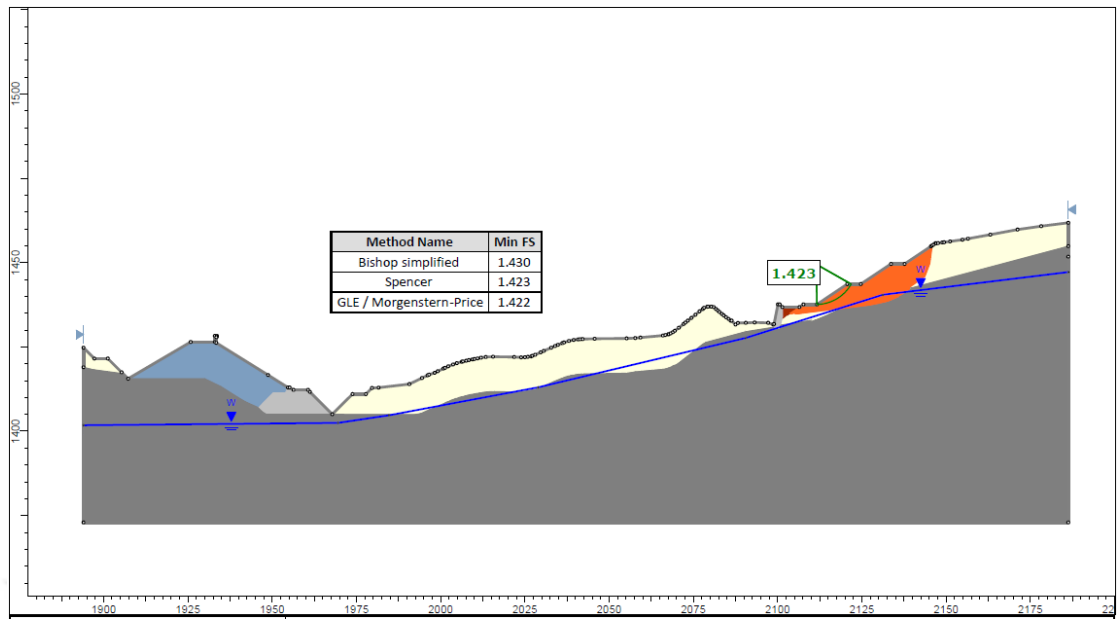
Static evaluation of the 1V:1.5H profile with stone retaining wall at Section B-B (FS=1.423)
